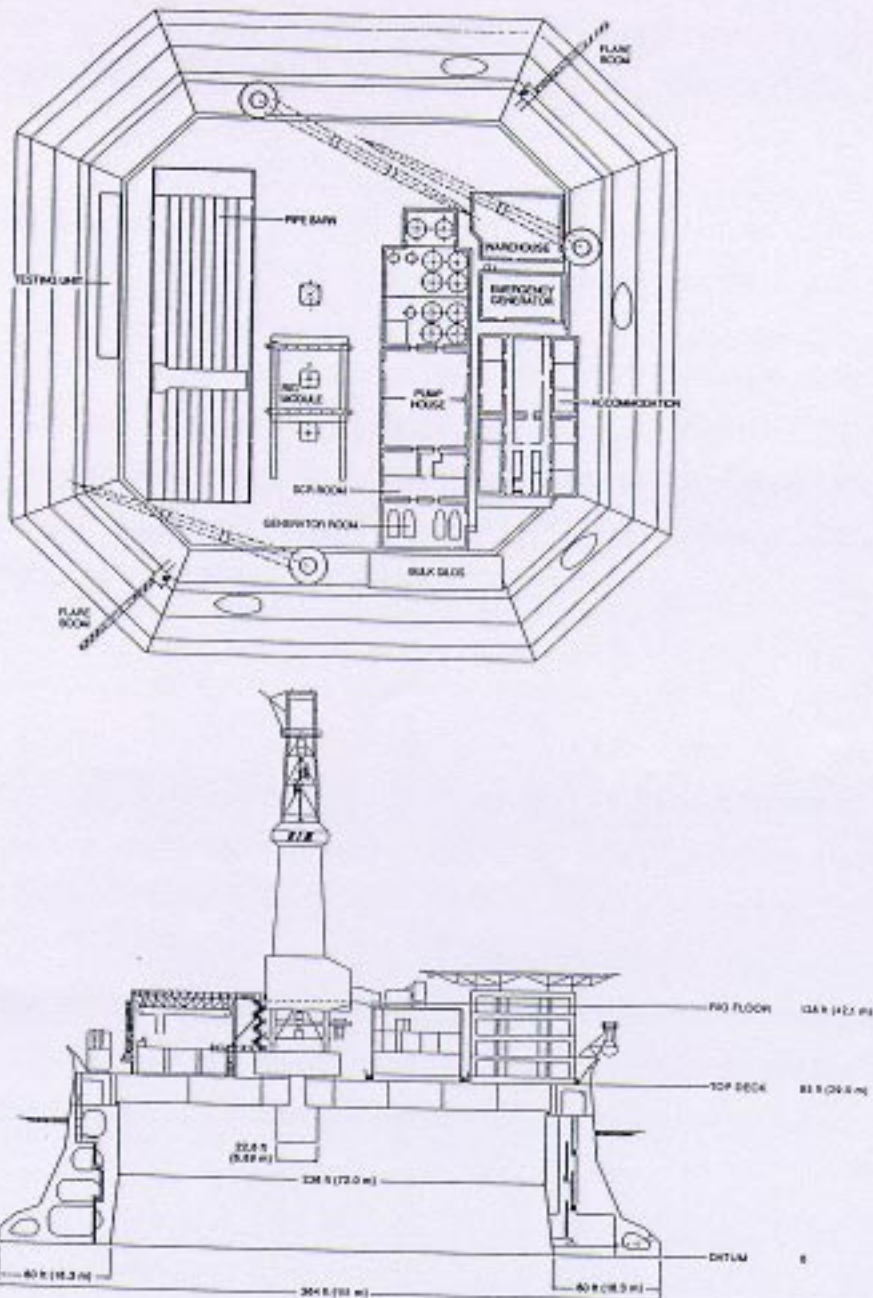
Plan view and cross section of the Molikpaq caisson.
